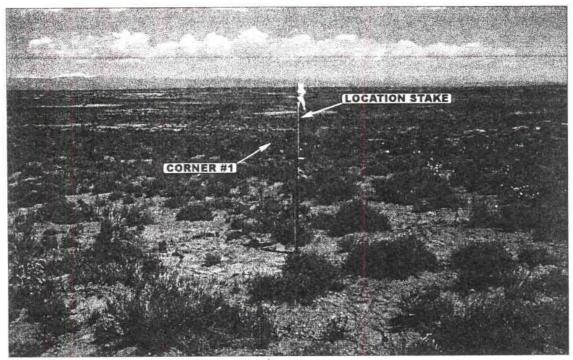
PHOTO: VIEW FROM LOCATION STAKE TO CORNER #1
